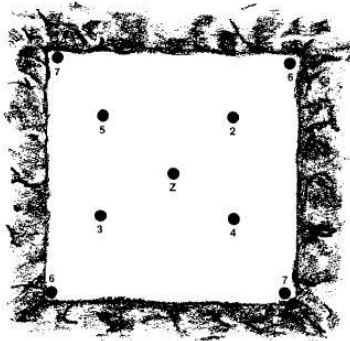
Vertical Crater Retreat (VCR); Drop Raise Pattern; Millisecond Delay; 6 1/2-in. Diameter Holes.
